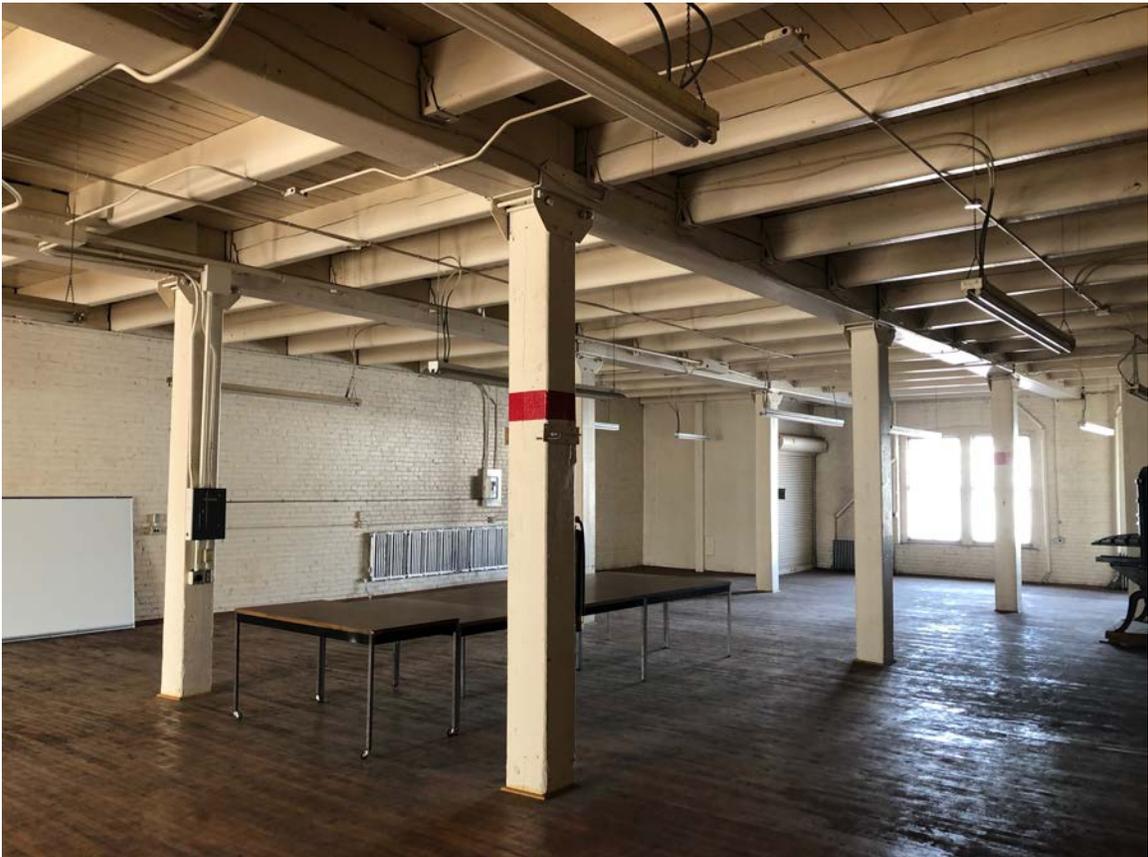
Second floor, looking northwest in the 1912-13 addition, showing the smaller freight elevator in the far corner.
